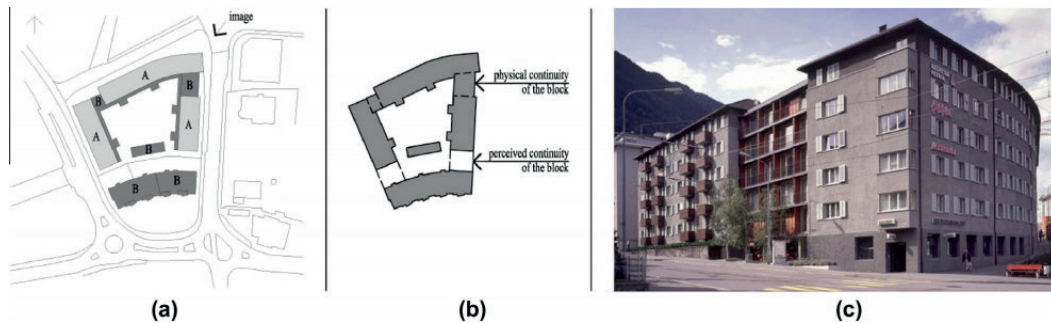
Residential block, Chur, Switzerland. Plan of residential block after renovation (a and b). Buildings “A” are existing; buildings “B” are additions that close the perimeter of the block. © [Detail]. Reproduced by permission of detail. Residential block after renovation with the addition of a new building (c). © [Ralph Feiner]. Reproduced by permission of Dieter Jüngling and Andreas Hagmann.
